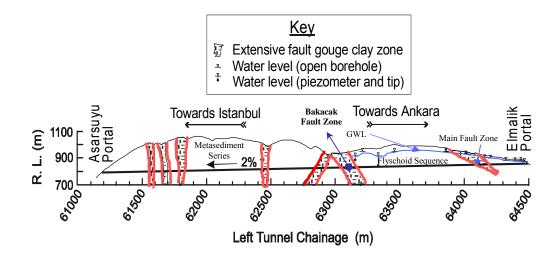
Simplified geological profile of the tunnel alignment (after Işık and Özben, 2007)
